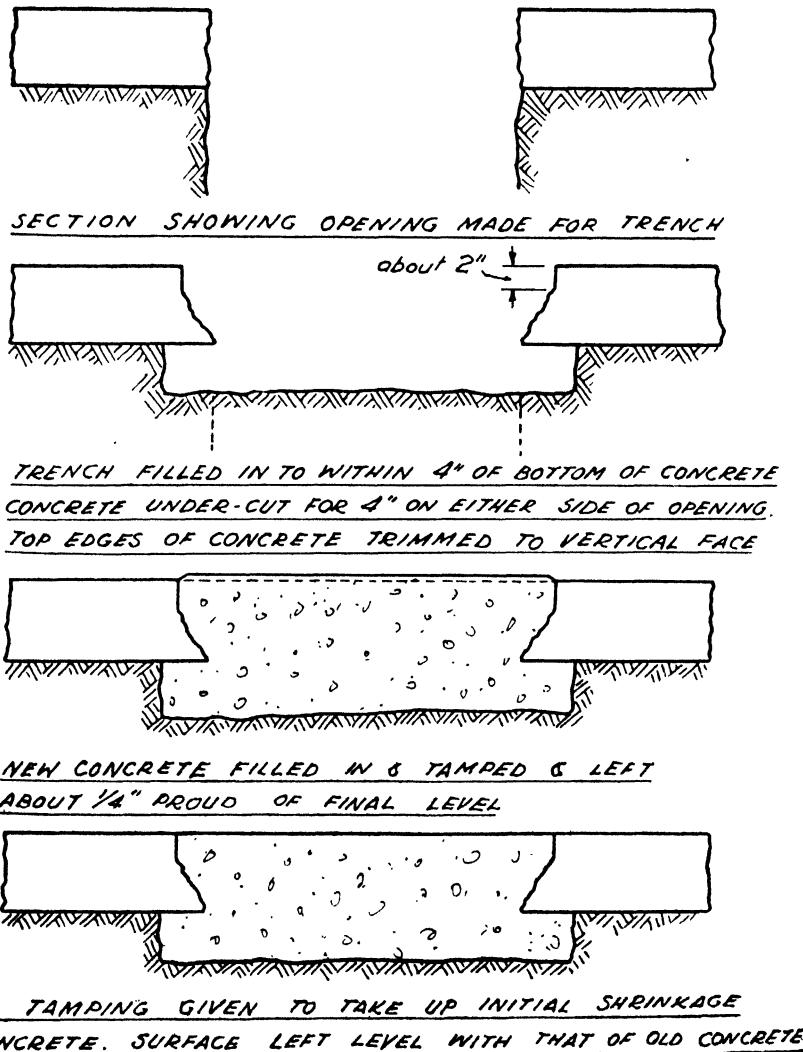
METHOD OF REPAIRING FRACTURED CONCRETE ROAD
